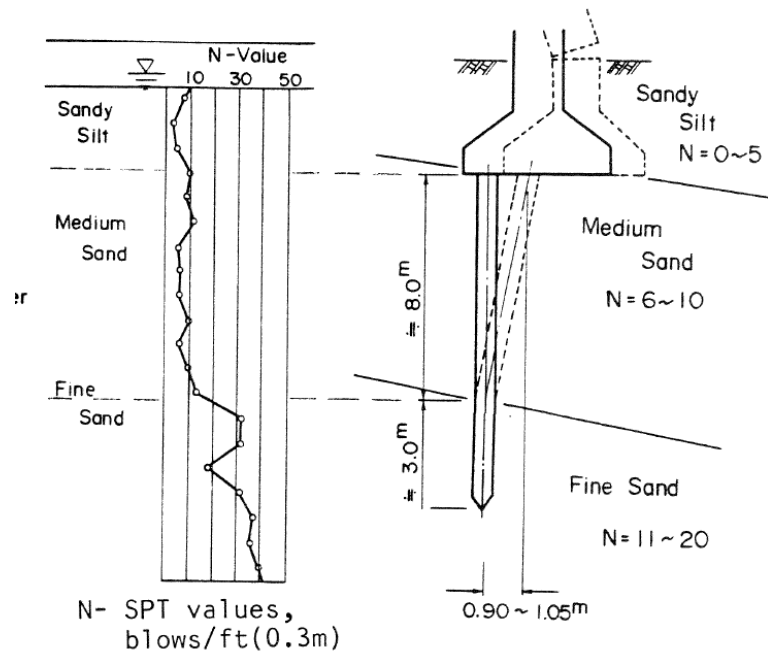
Damaged pile of the NHK-Building, from (Kawamura et al., 1992)
